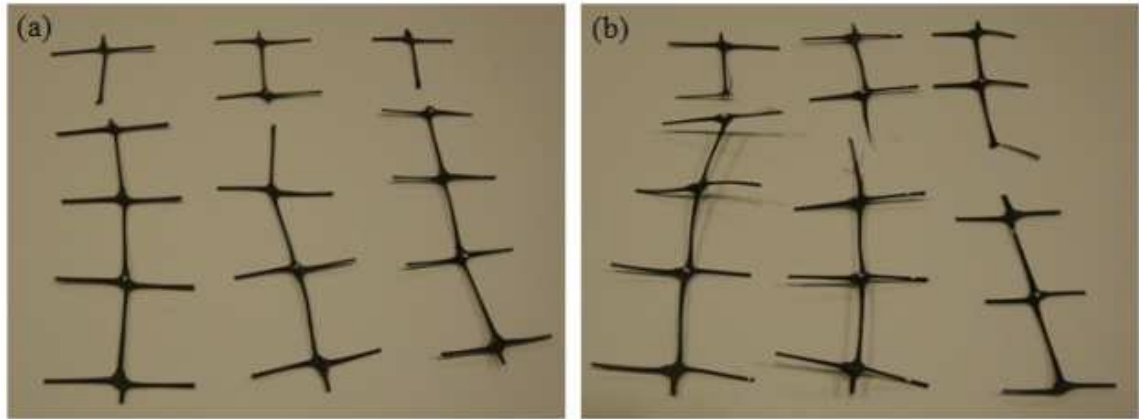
Damaged EGG2 (single layer) geogrid rib strength test specimens after the test: (a) MD specimens, (b) XD specimens
